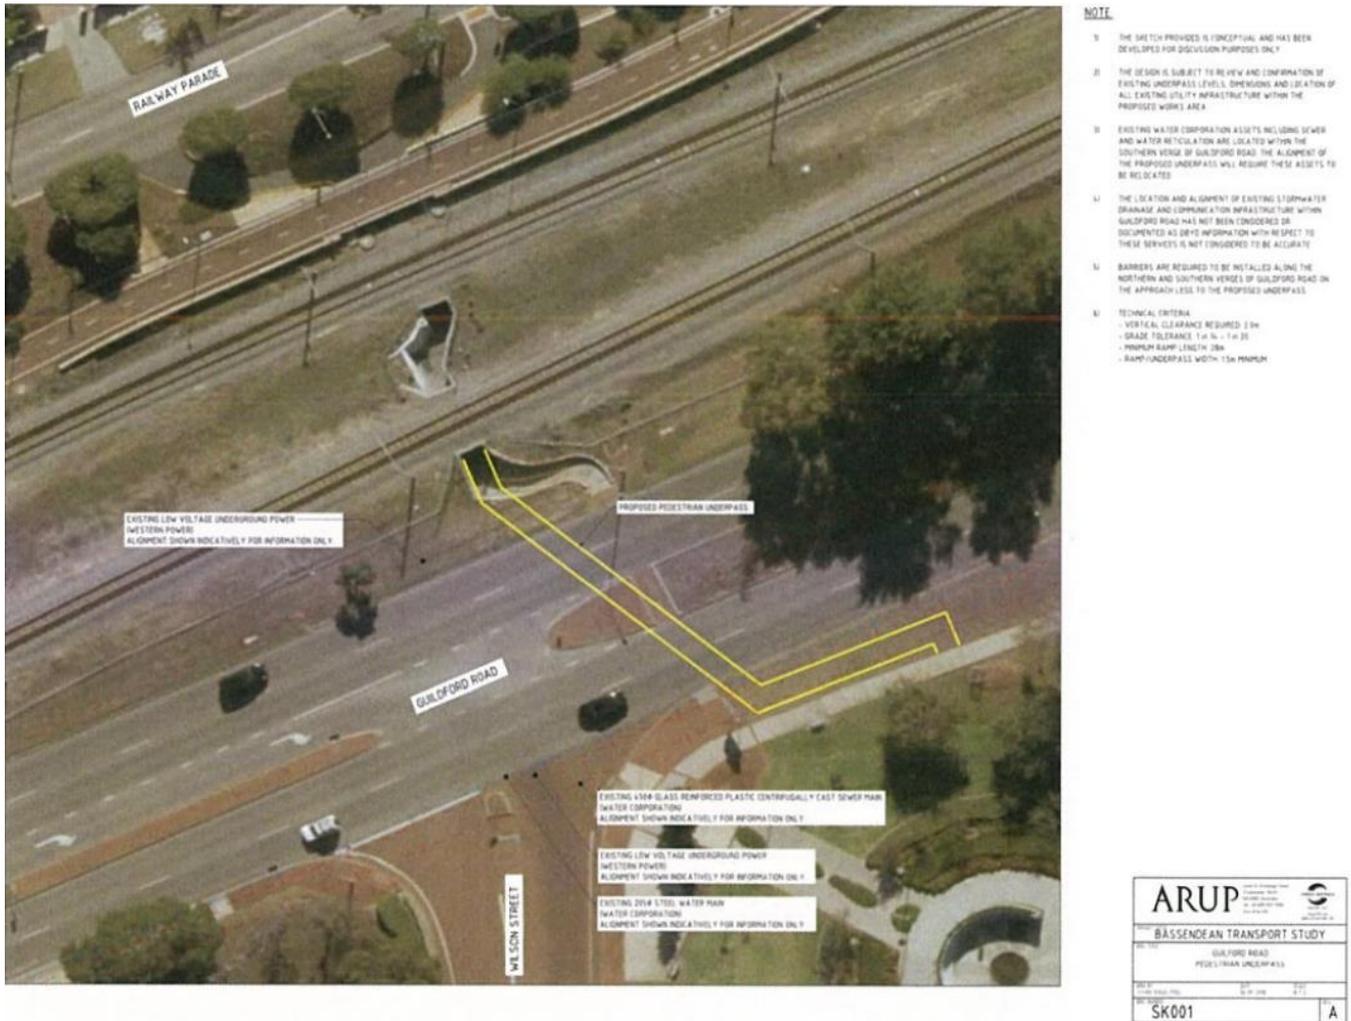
Concept for extension of existing railway underpass (Source: Town of Bassendean Integrated Transport Strategy)
